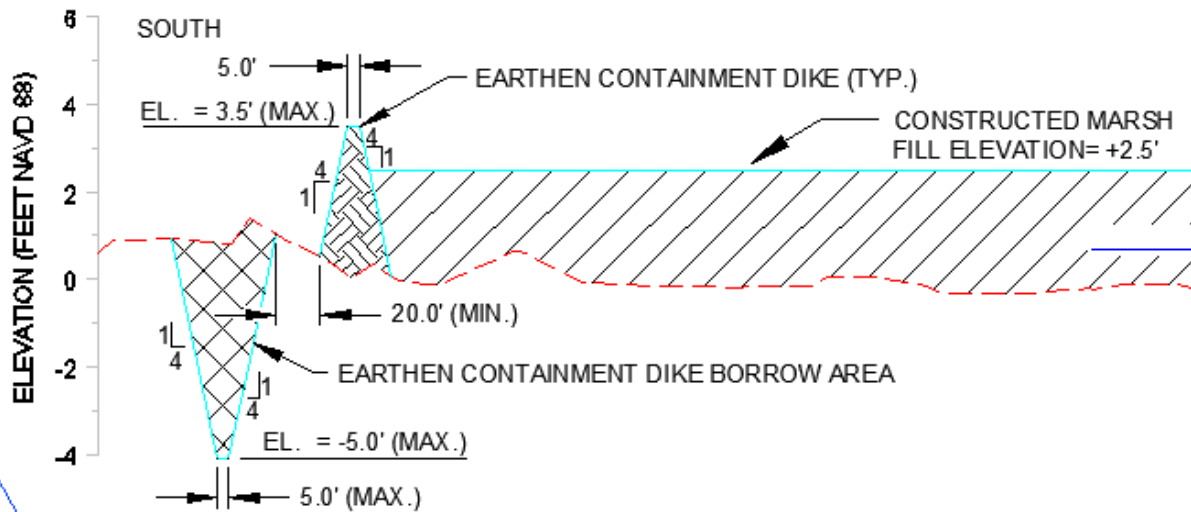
Typical earthen containment dike section for borrowing outside of Marsh Creation Fill Area 3.
